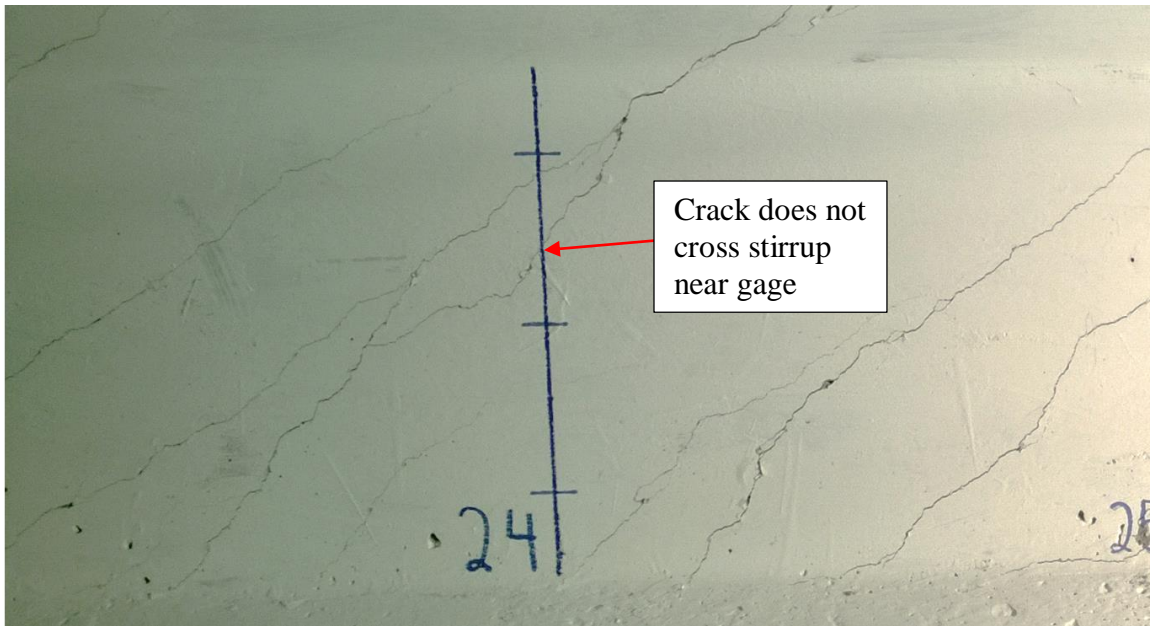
Shear crack crossing long leg of stirrup 24 following 36M_18F test (offset relative to opposite side of web).
